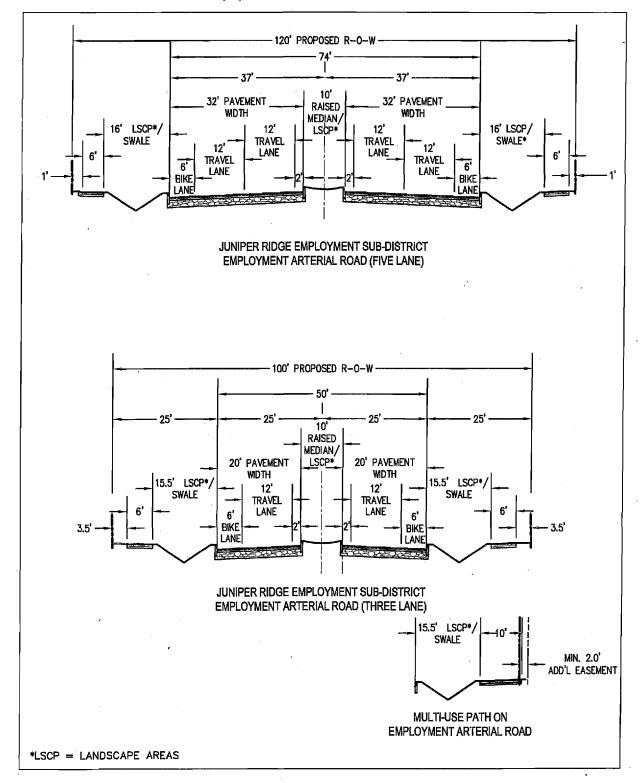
C.1 Employment Sub-District Street Cross Sections
